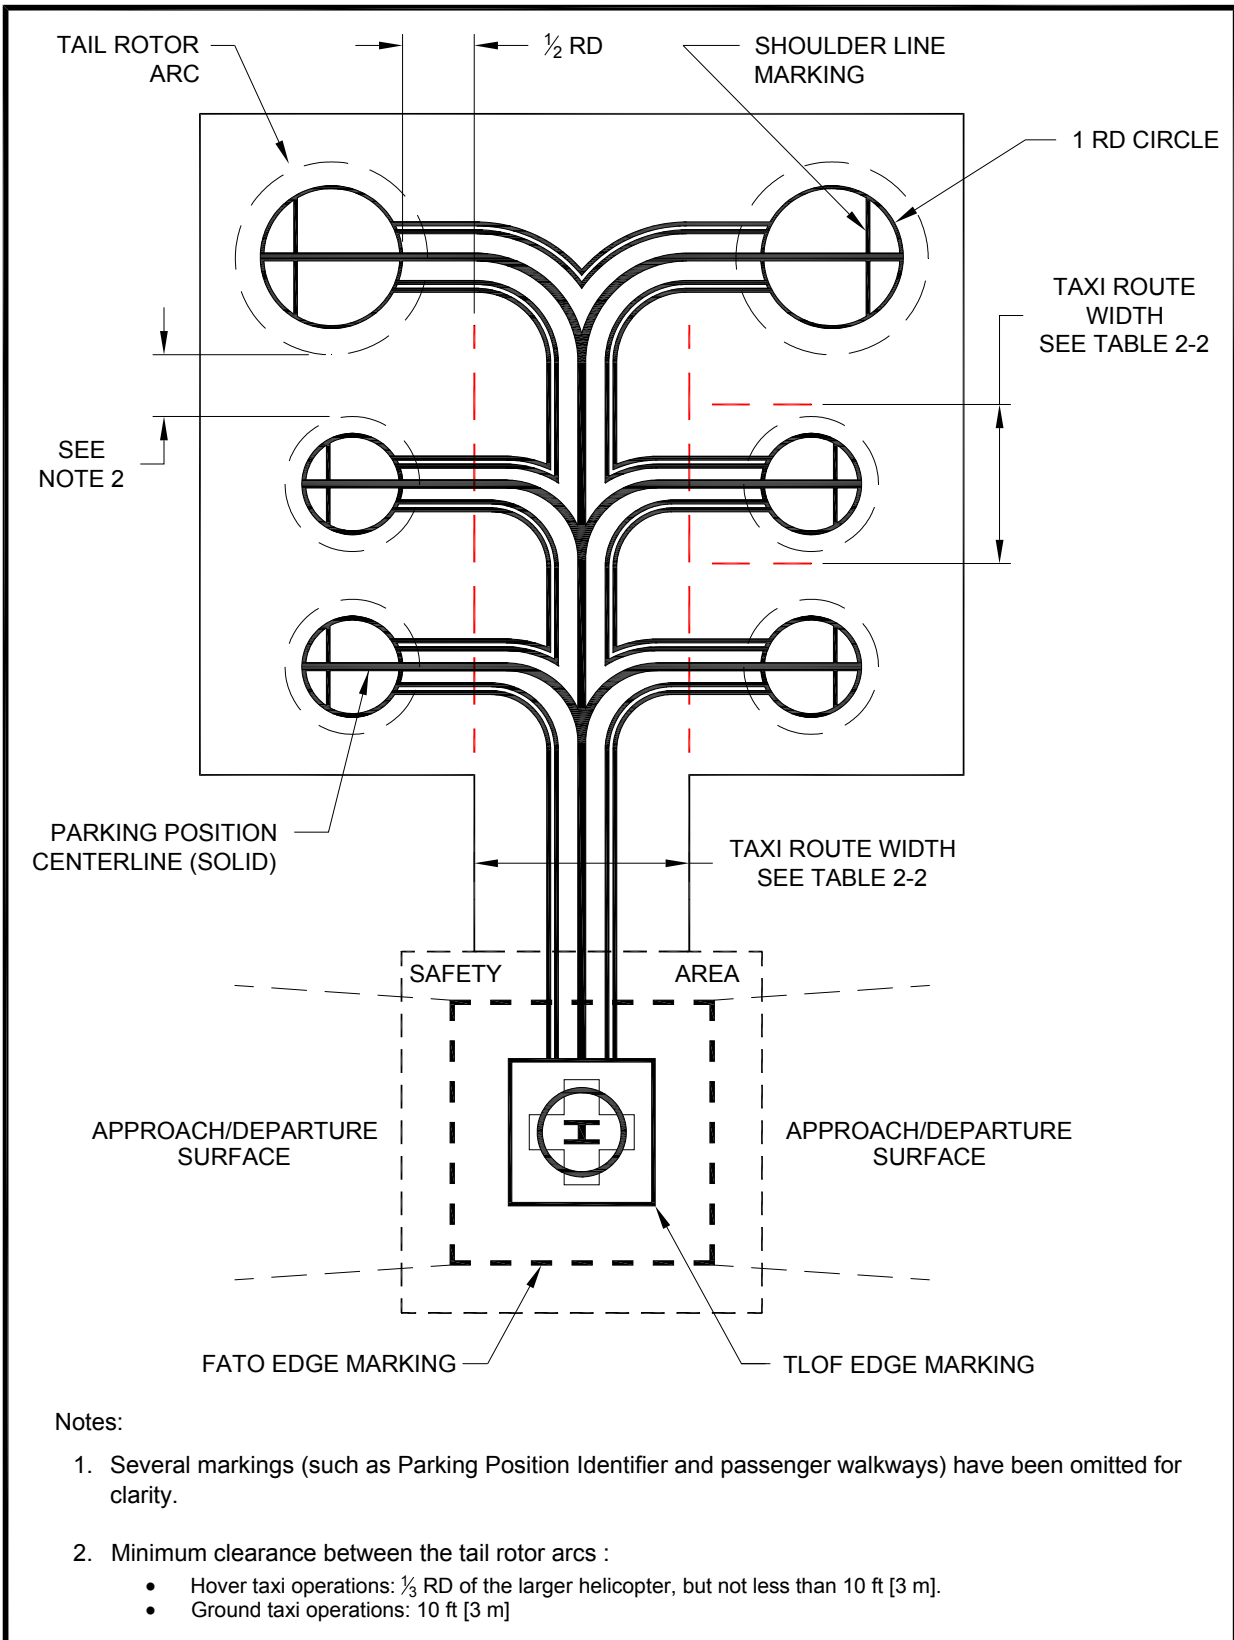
Parking Area Design – “Back-out” Parking Positions: Hospital
